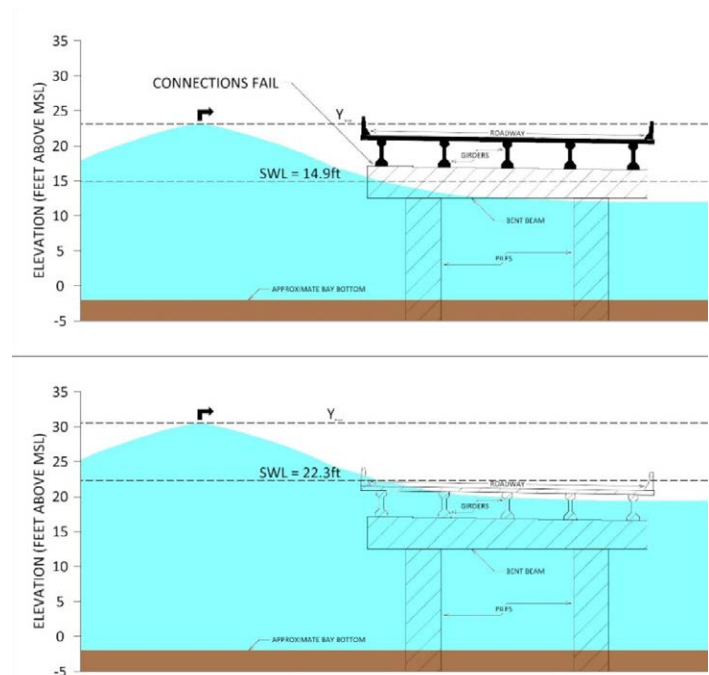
Analysis results showing bridge connection failures at SWL +14.9 feet and bridge failure at the storm scenario SWL +22.3 feet.
